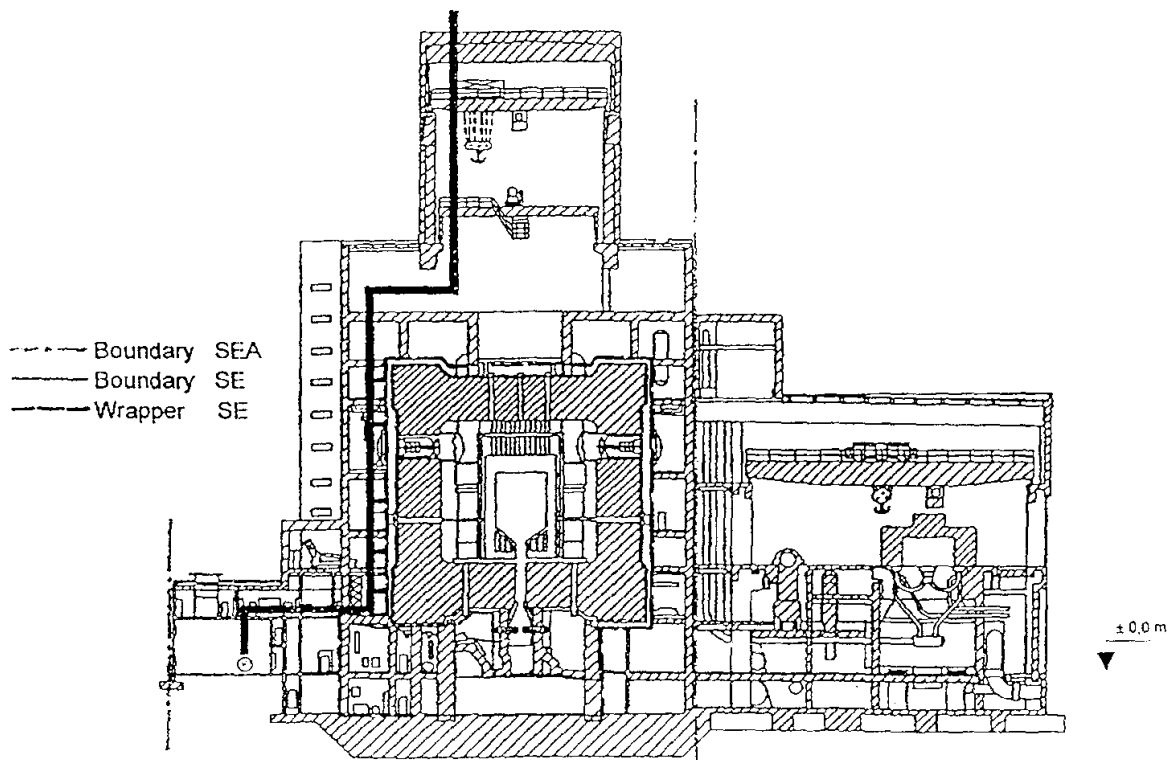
Safe enclosure concept (Reaktor building sectional drawing)
